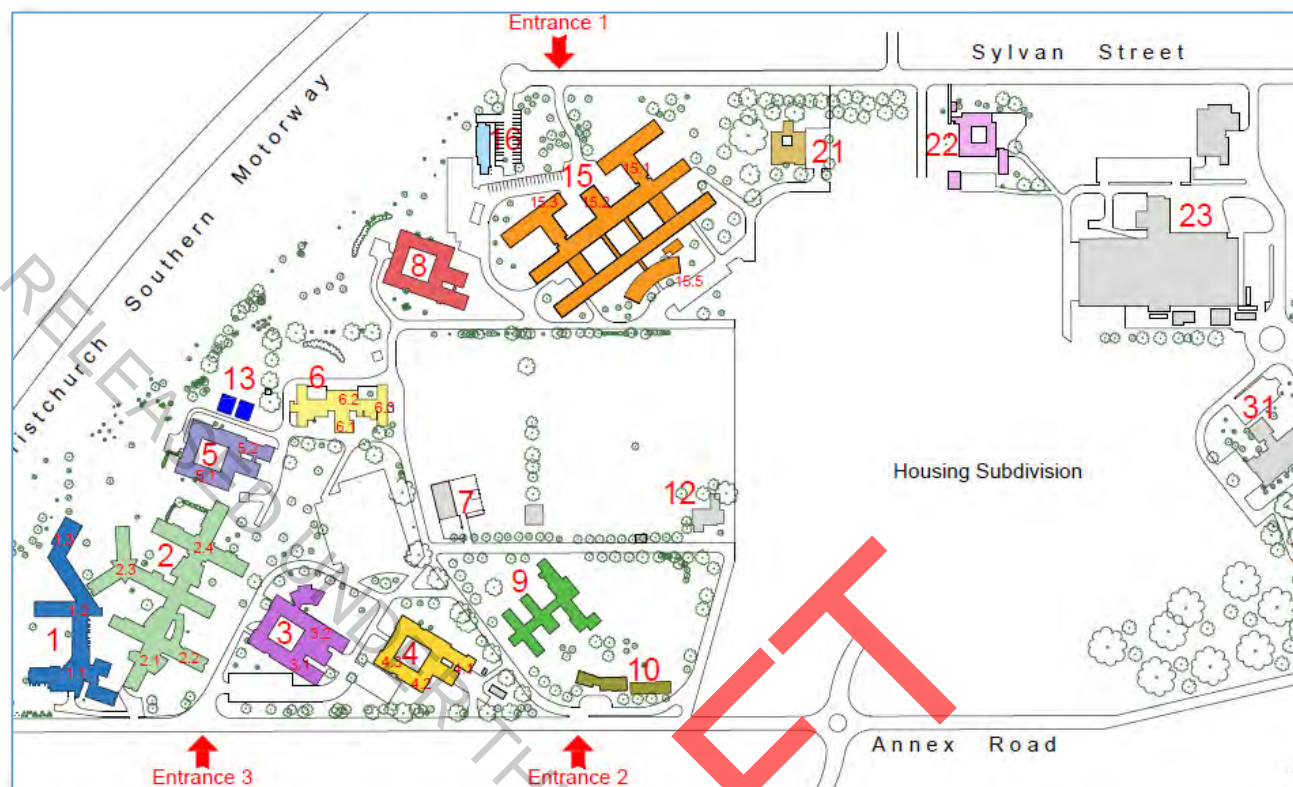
Site Plan Showing locations of Buildings Surveyed.
